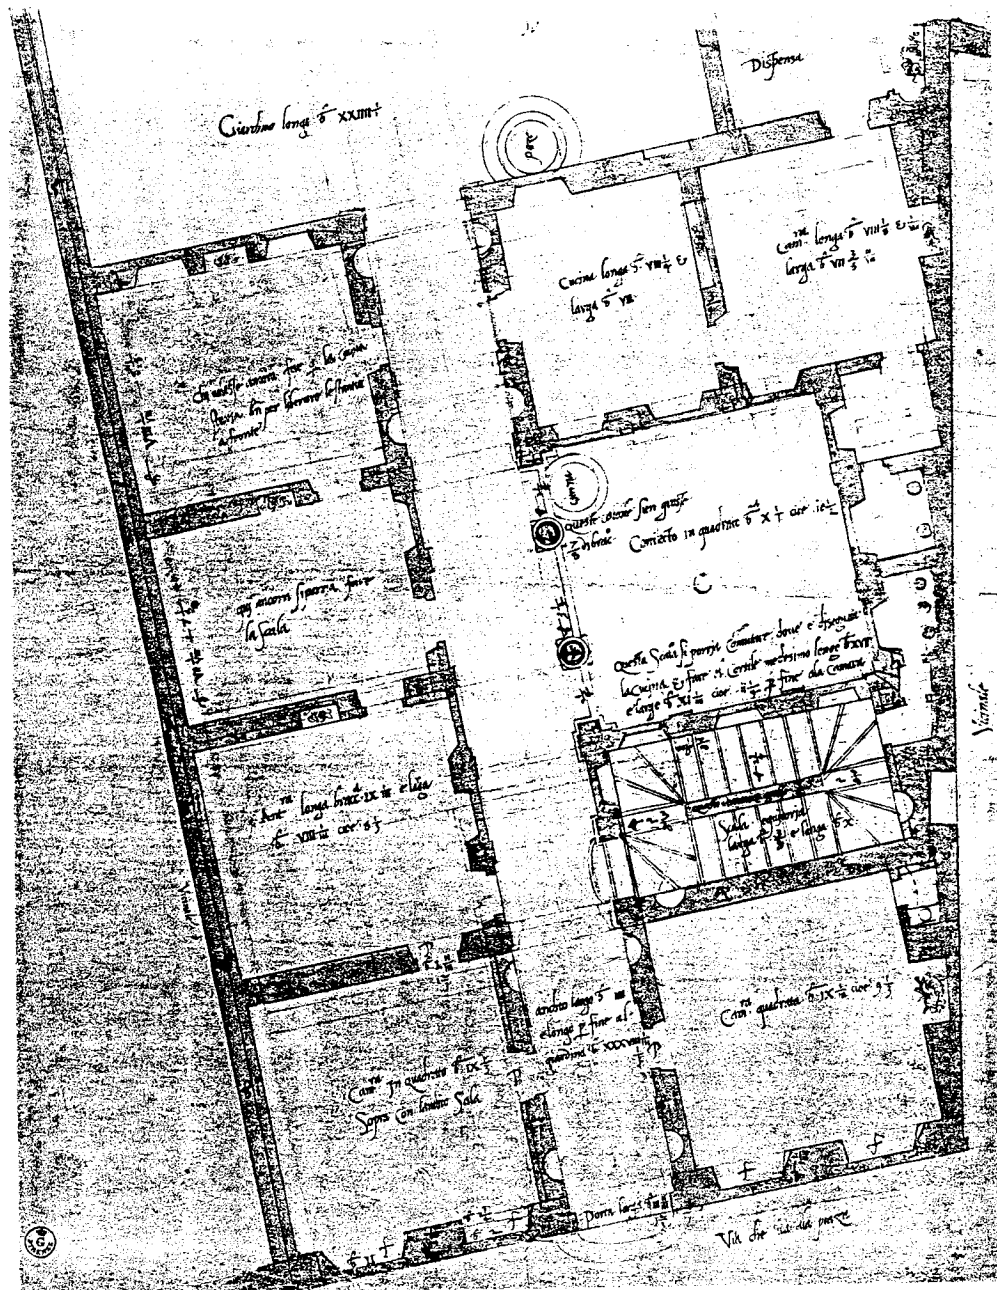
Baldassare Peruzzi: plan "C" for Palazzo Ricci (Uffizi 357)
